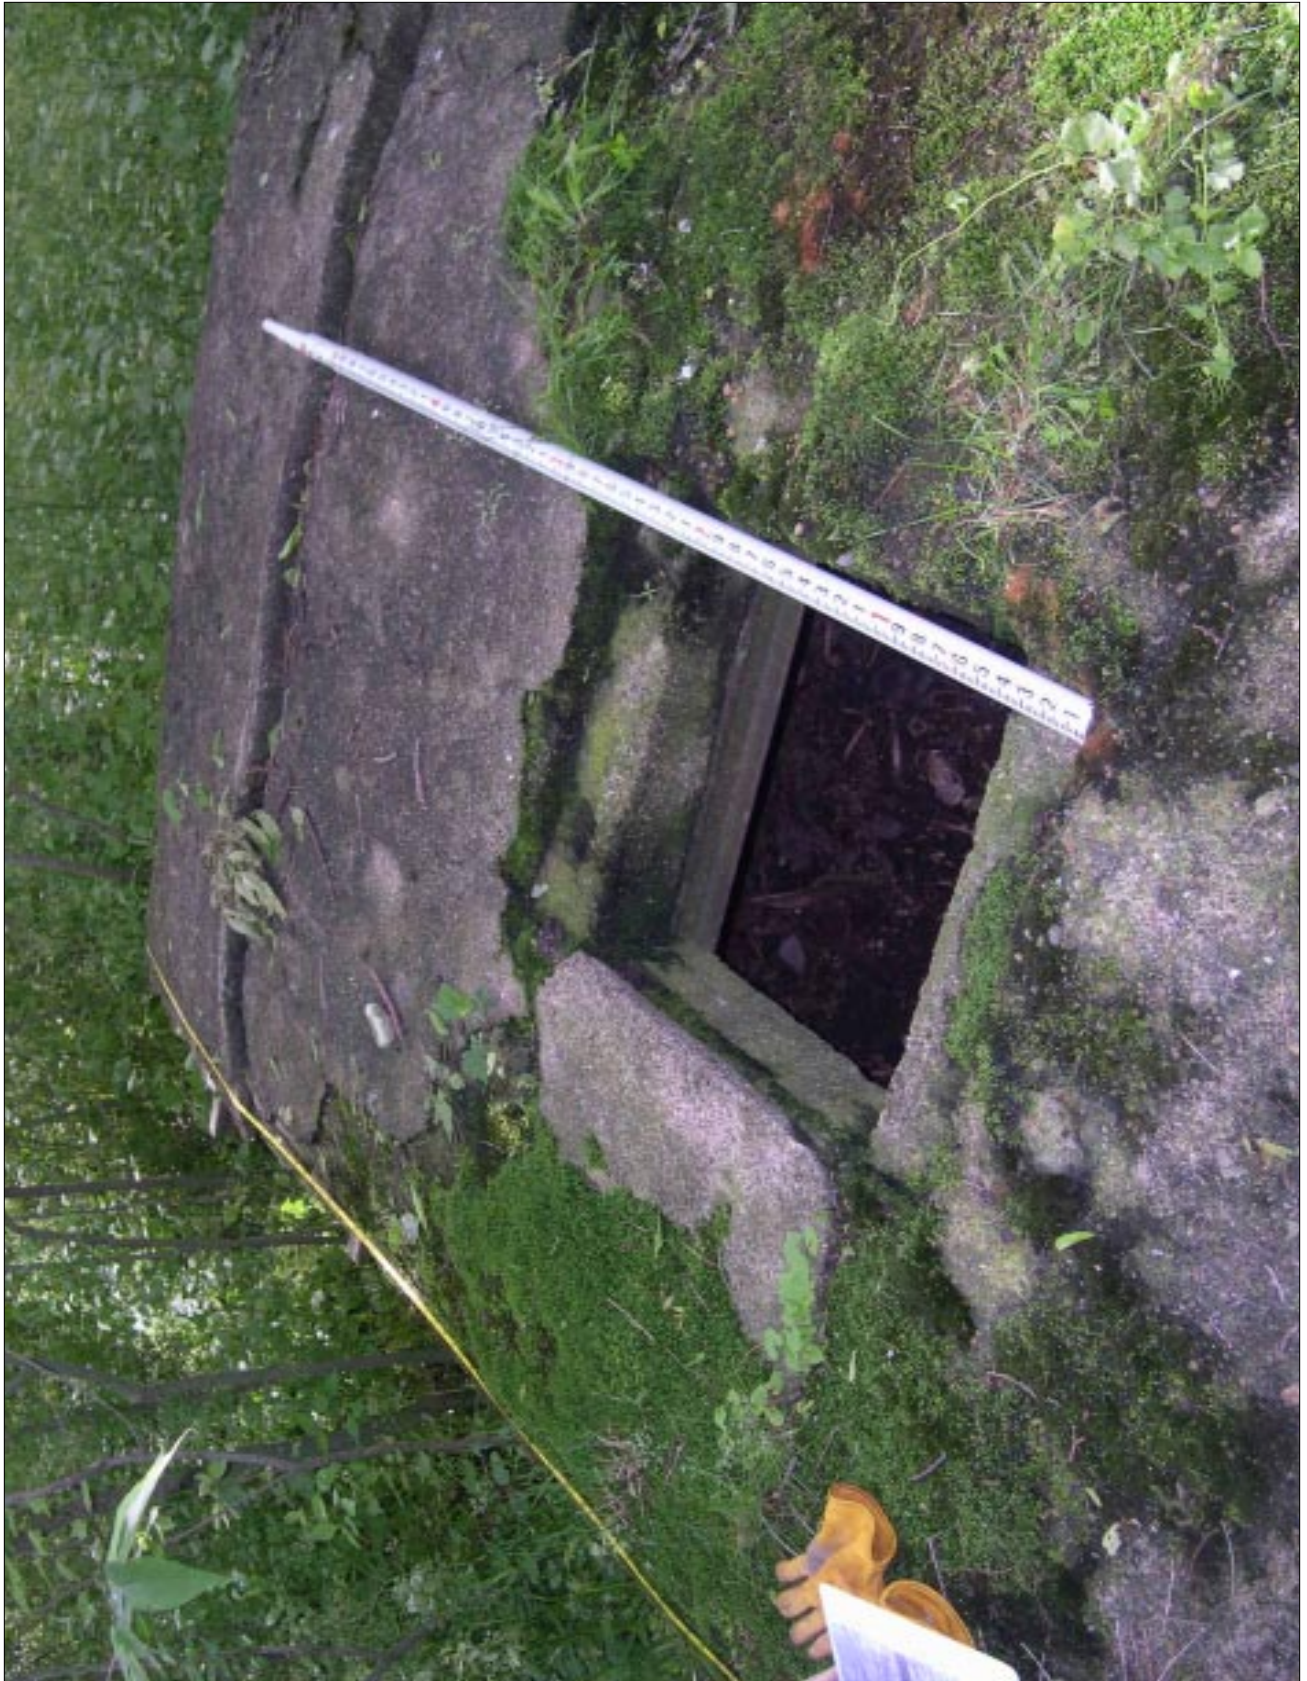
Isolated upground cistern (ca. 1910) located approximately 72 m southwest of Lincoln House; note perimeter wall of limestone slabs (April 30, 2004).
